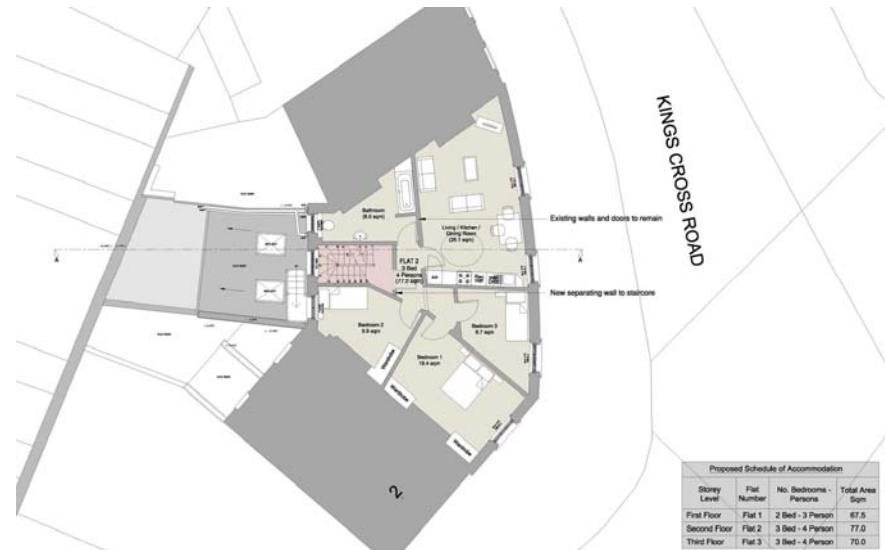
Proposed Second Floor Plan (All Internal existing walls to remain)
